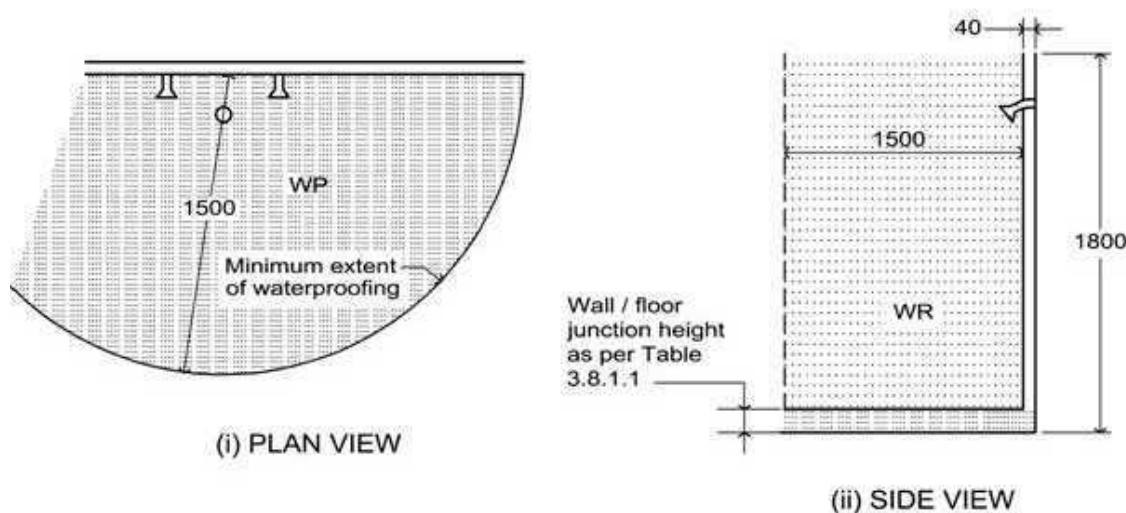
Unenclosed shower on concrete or compressed fibre cement sheet floor
